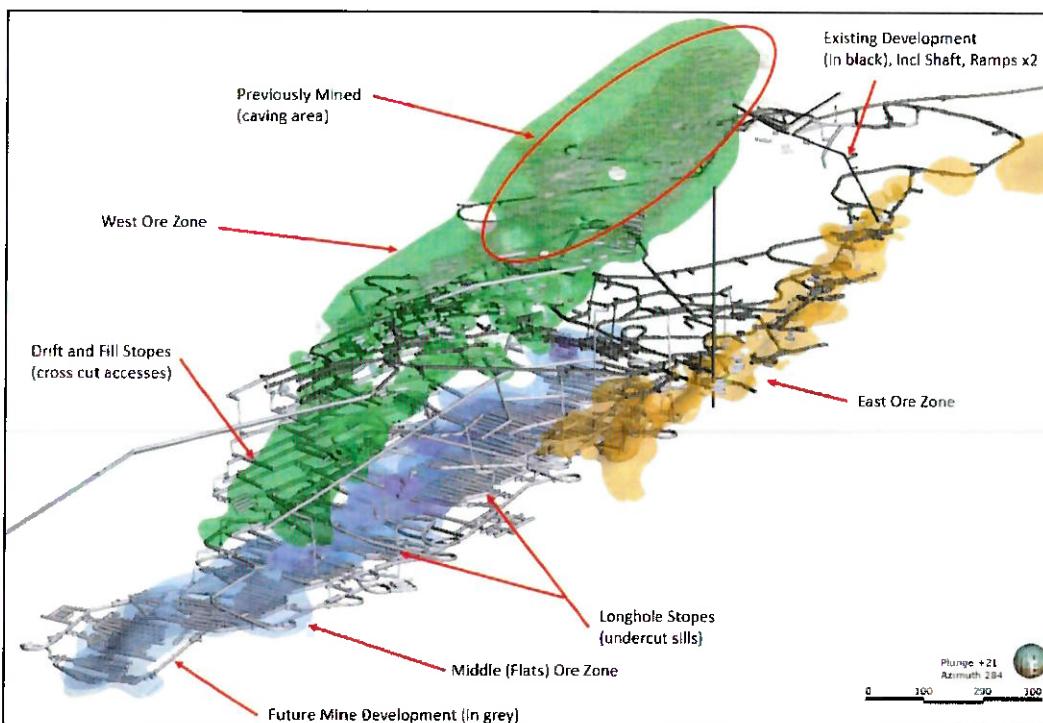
Olympias Mine Existing and Planned Underground Development
